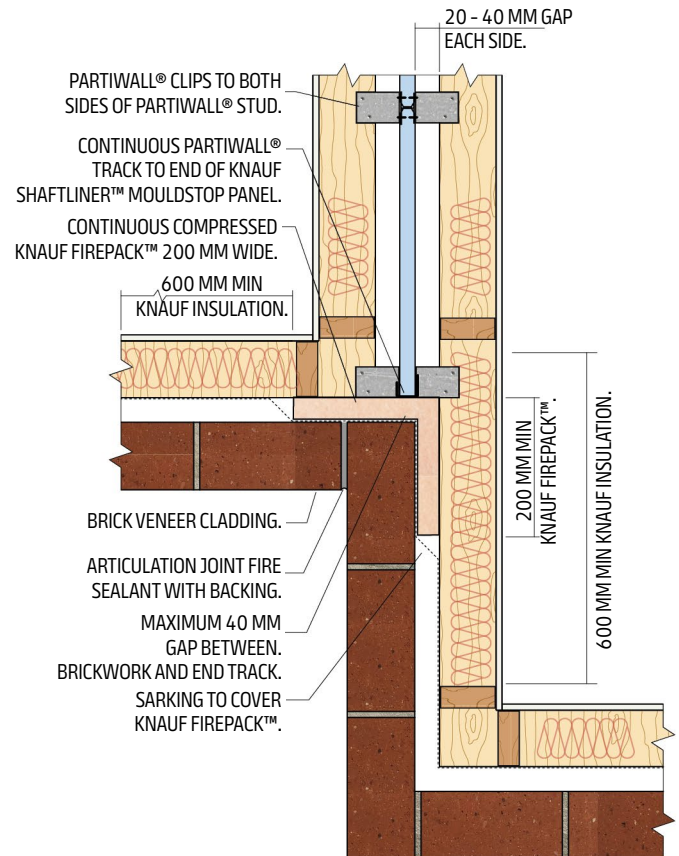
Brick Veneer Wall Junction 2 – Plan View
